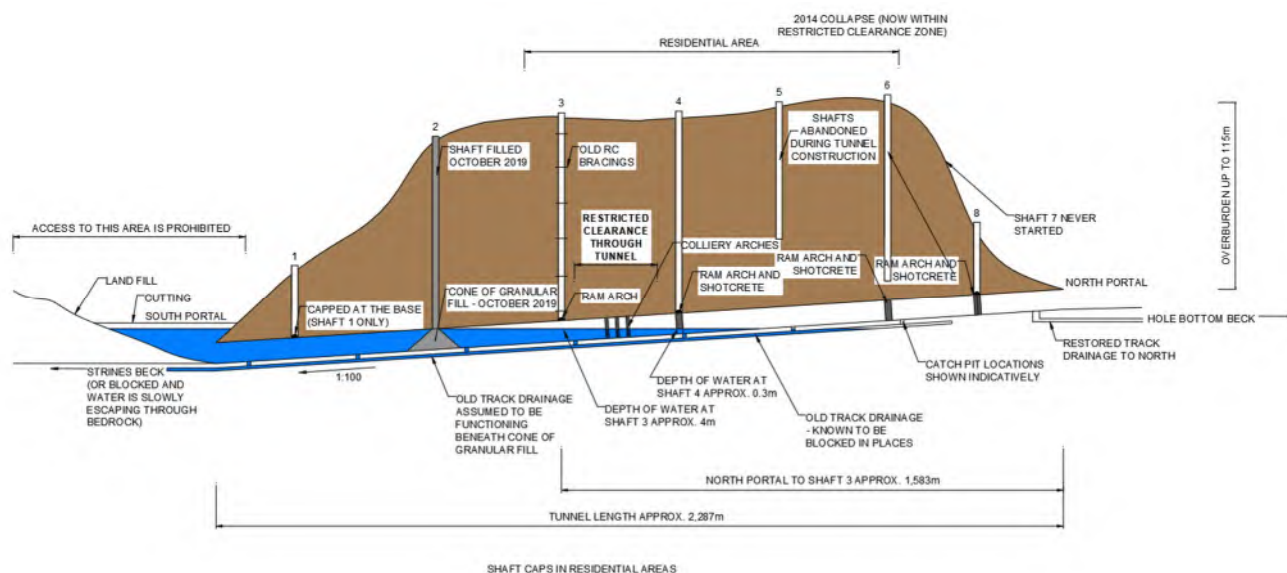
Schematic Long Section Through Tunnel (Current Arrangement)
